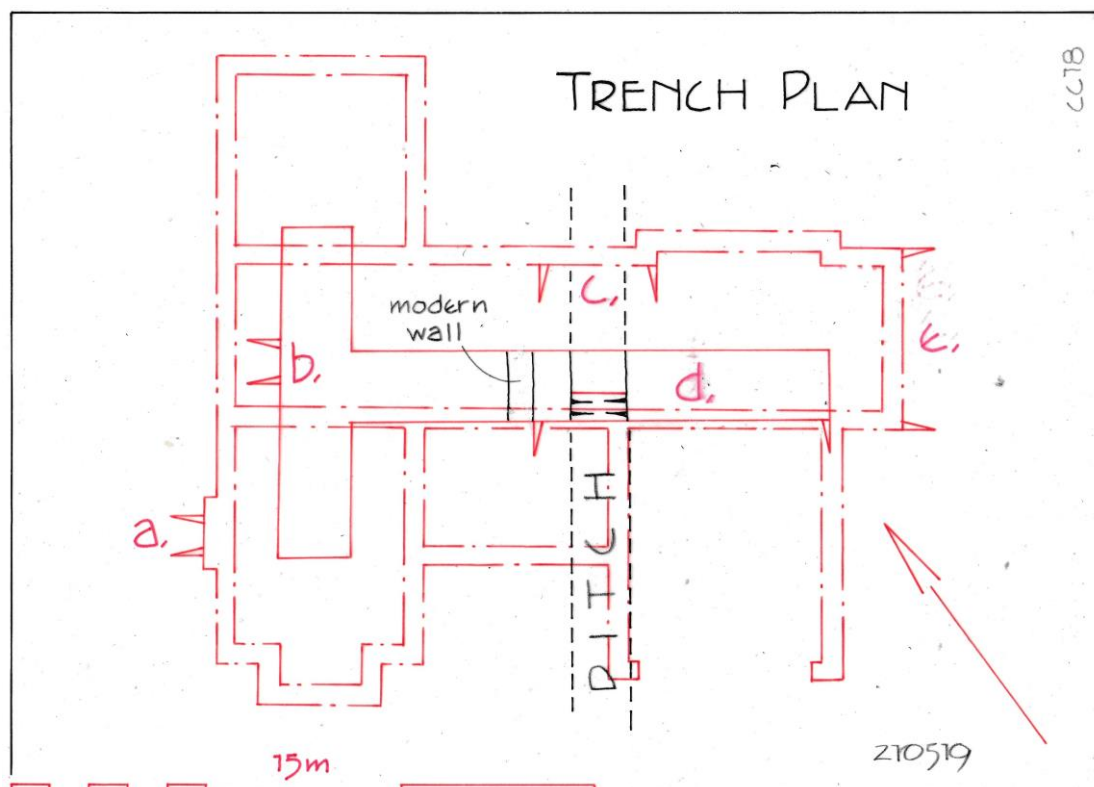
; trench plan showing location of evaluation trench 1 and the subsequent strip foundation trench 2 for the new dwelling (also with section locations)
